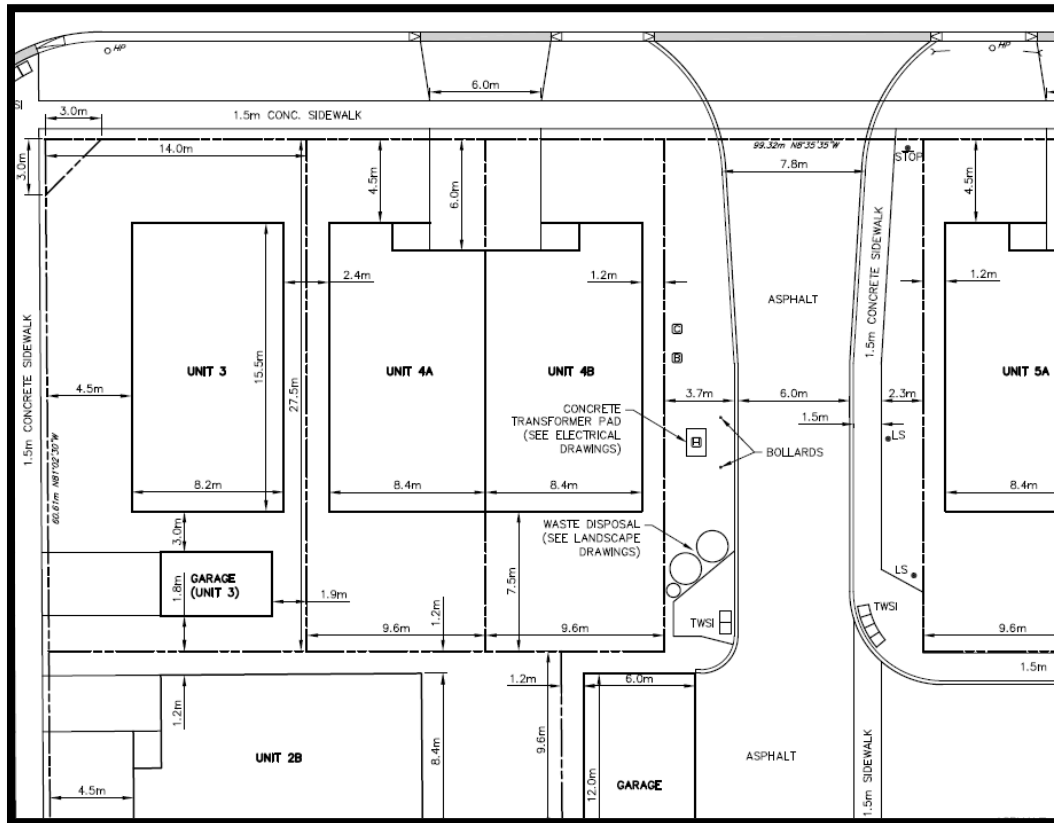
Development Concept Site Plan Detail; Annex Driveway and Lotting
